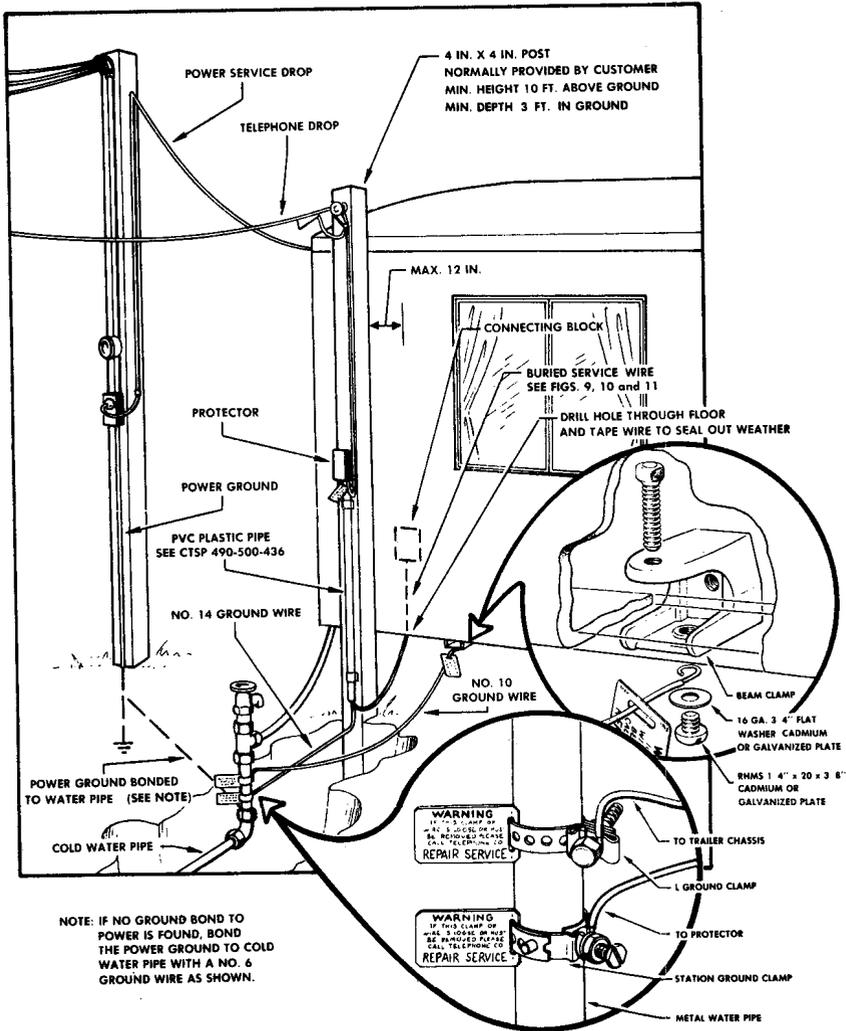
Typical Installation—Aerial Distribution Water Pipe Ground
